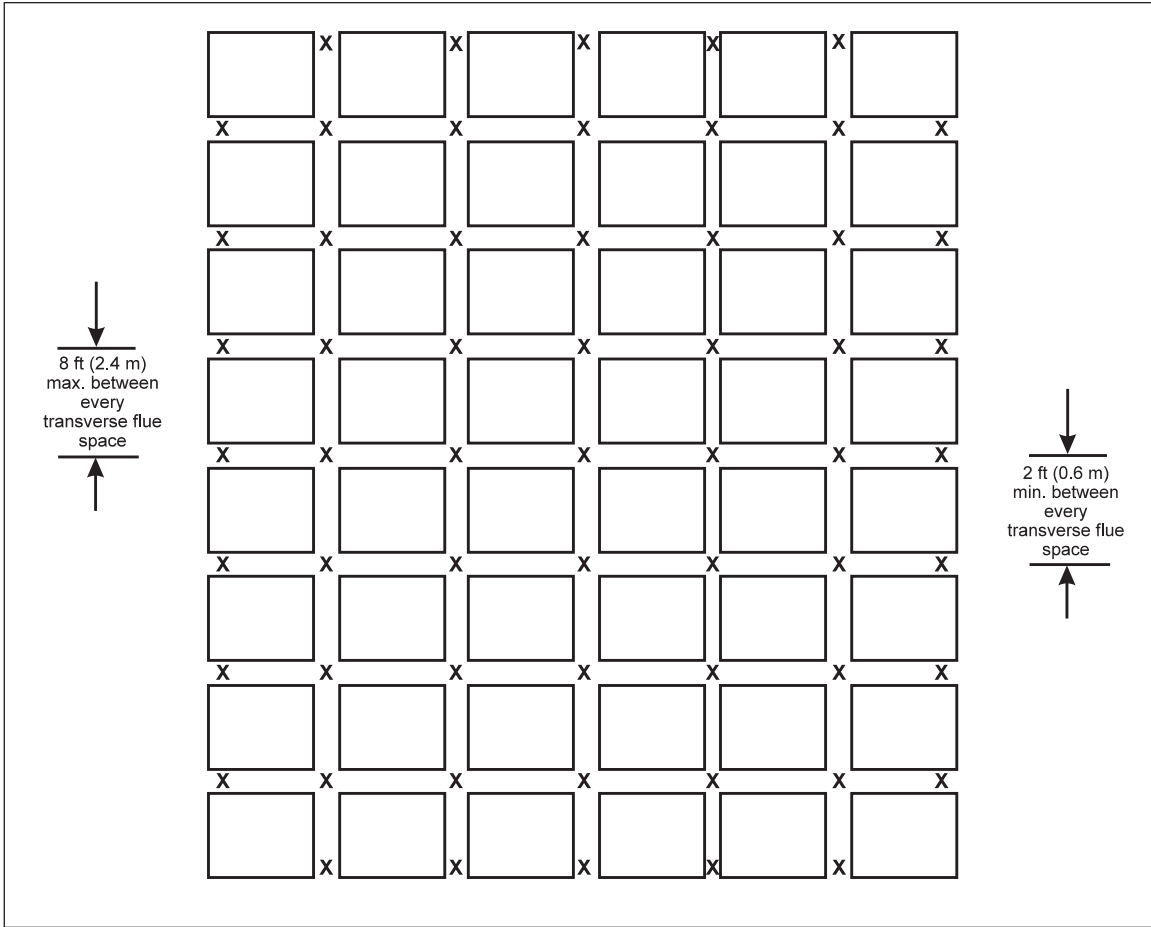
Plan view of IRAS(E) in-rack sprinkler arrangement for multiple-row racks
